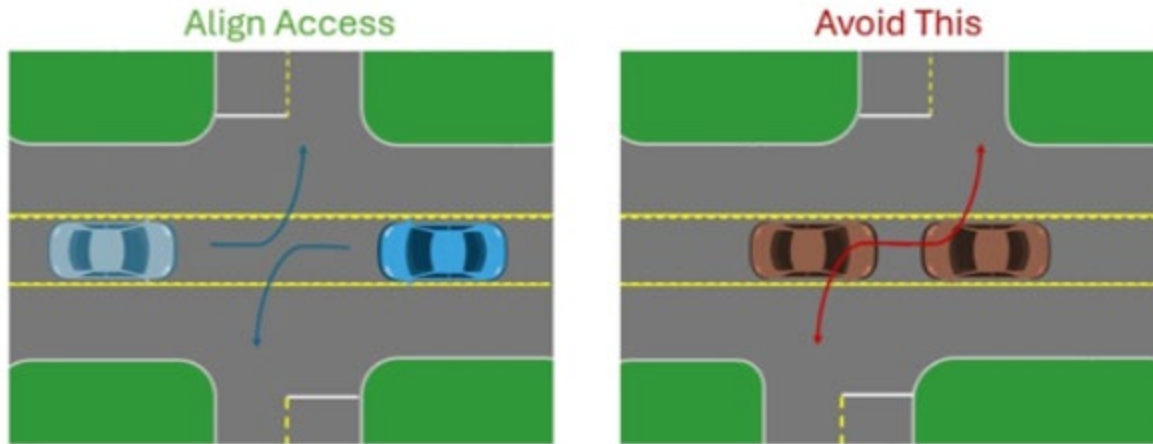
Driveway / Street Alignment for Left Turns - Driveways and streets must be aligned or offset enough to avoid crash conflict points.
